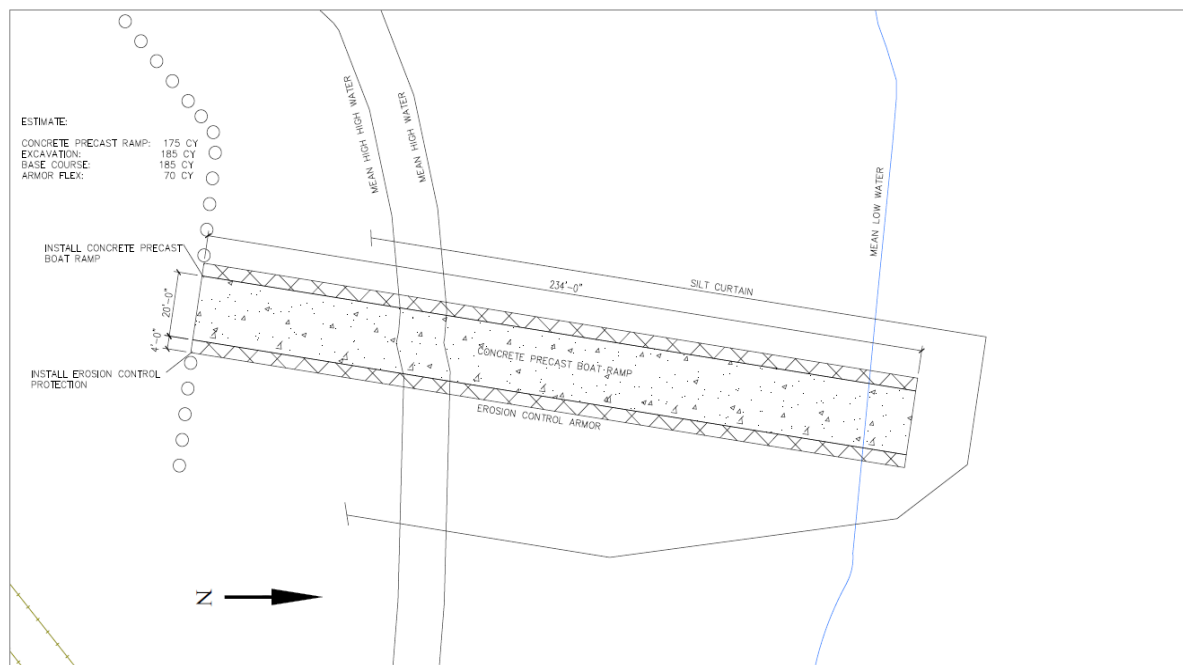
Zoomed-in plan view depicting the location of the proposed boat ramp
